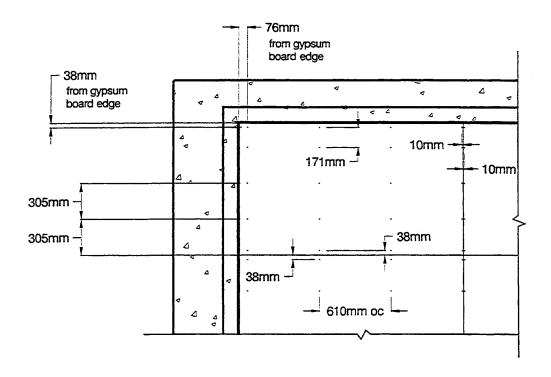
Screw patterns for face layer of gypsum board with resilient metal channels 610 mm o.c.
